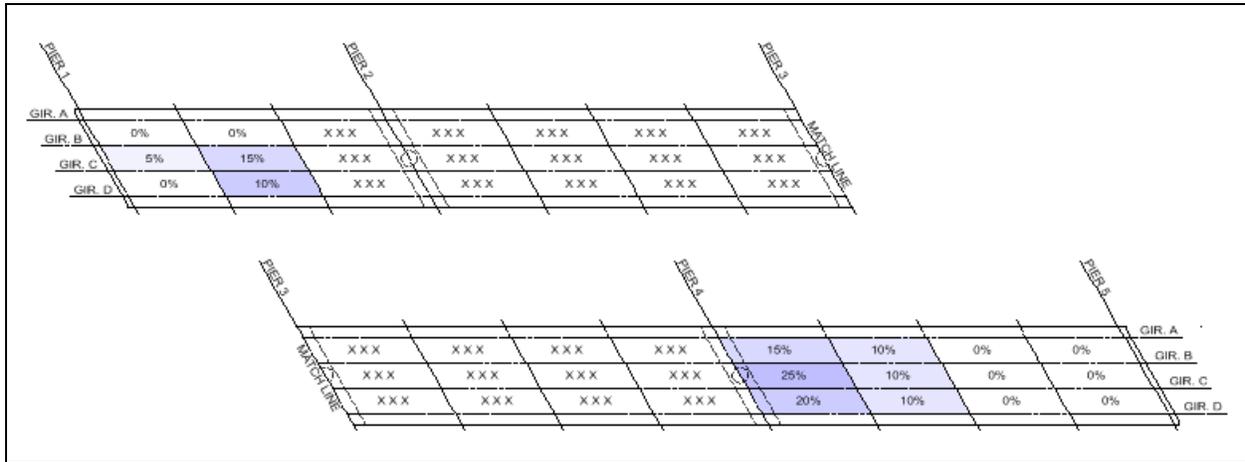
Bridge 105/4 Crack Intensity Diagram
